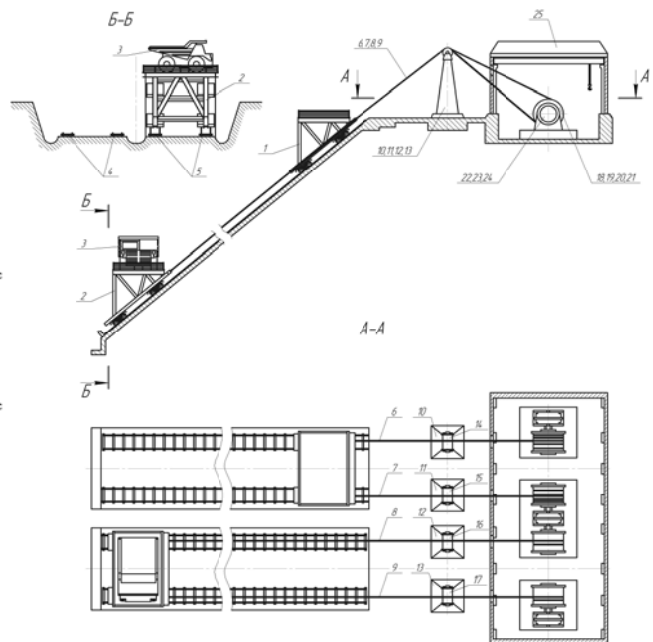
General view of a hoisting plant with a single-sided arrangement of two parallel tracks in a plane of a pit wall
